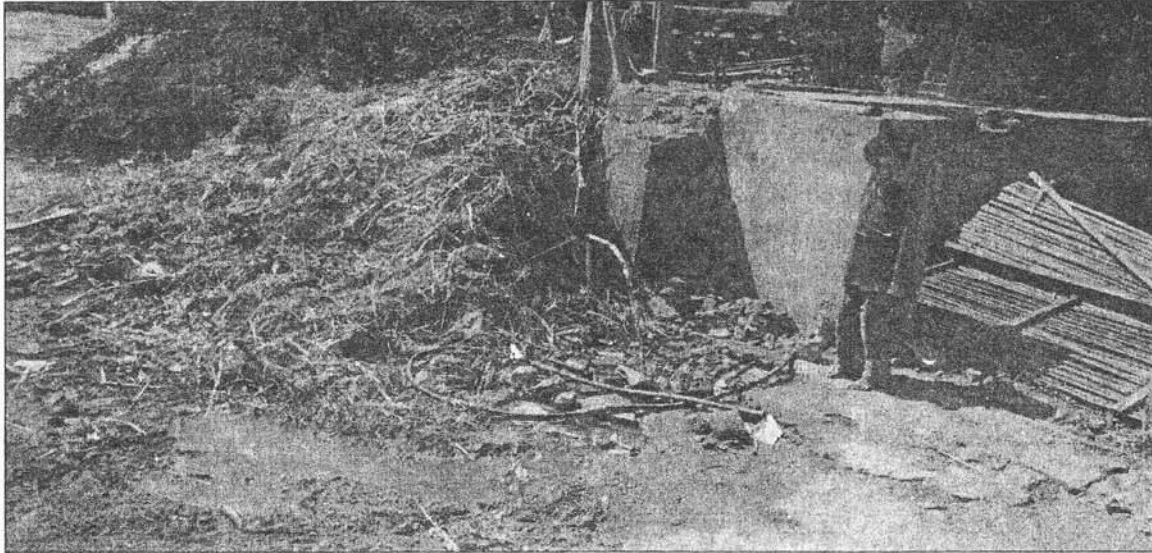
Unused Elevated Storage Reservoir in Amarsar Village
